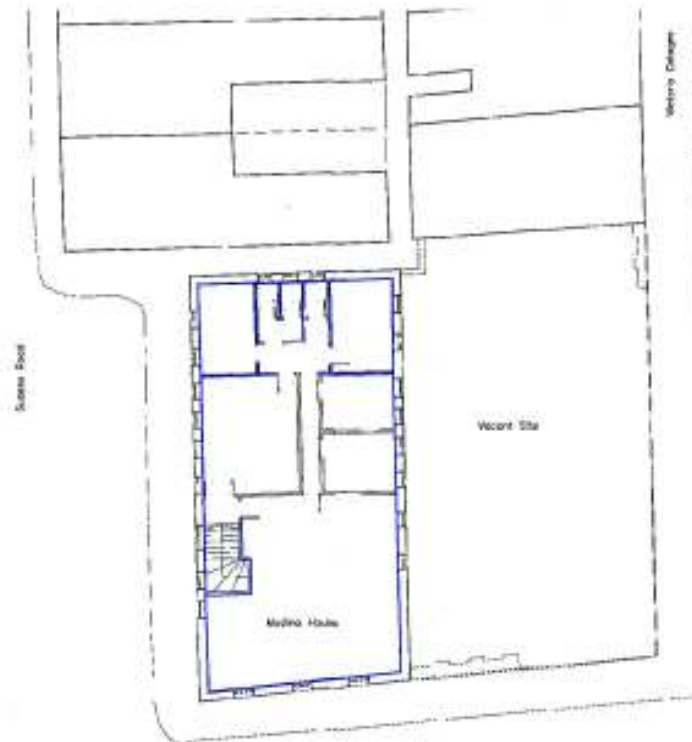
1st floor layout. Assumed original layout marked in blue (BHCC)
